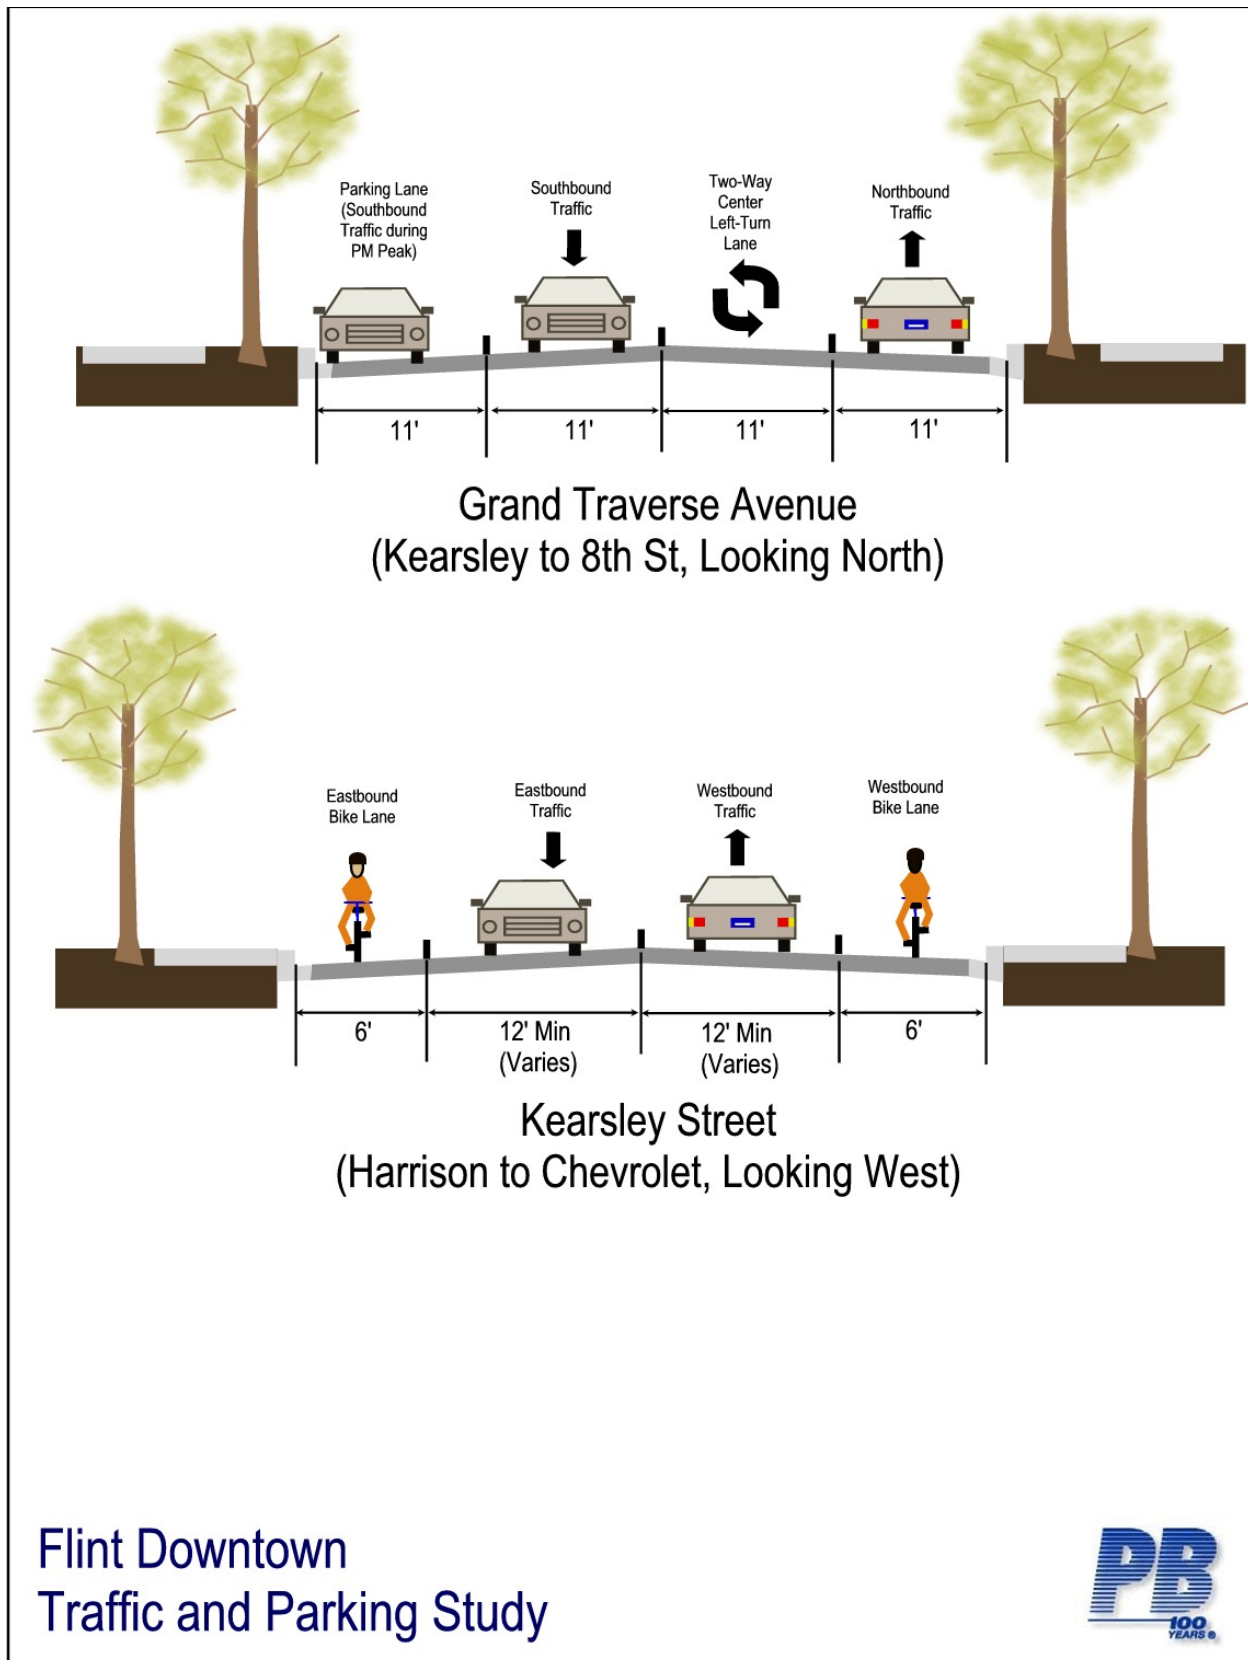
(Cont.): Recommended Typical Cross-Sections
